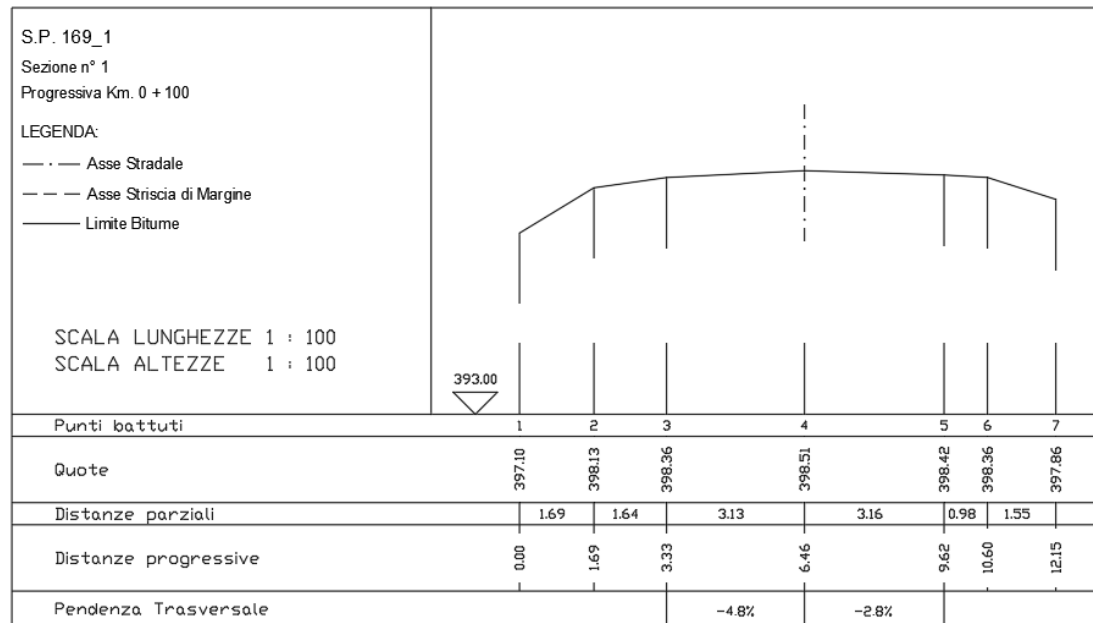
Cross Section Layout Example of SP 169_1 of Starting Point
